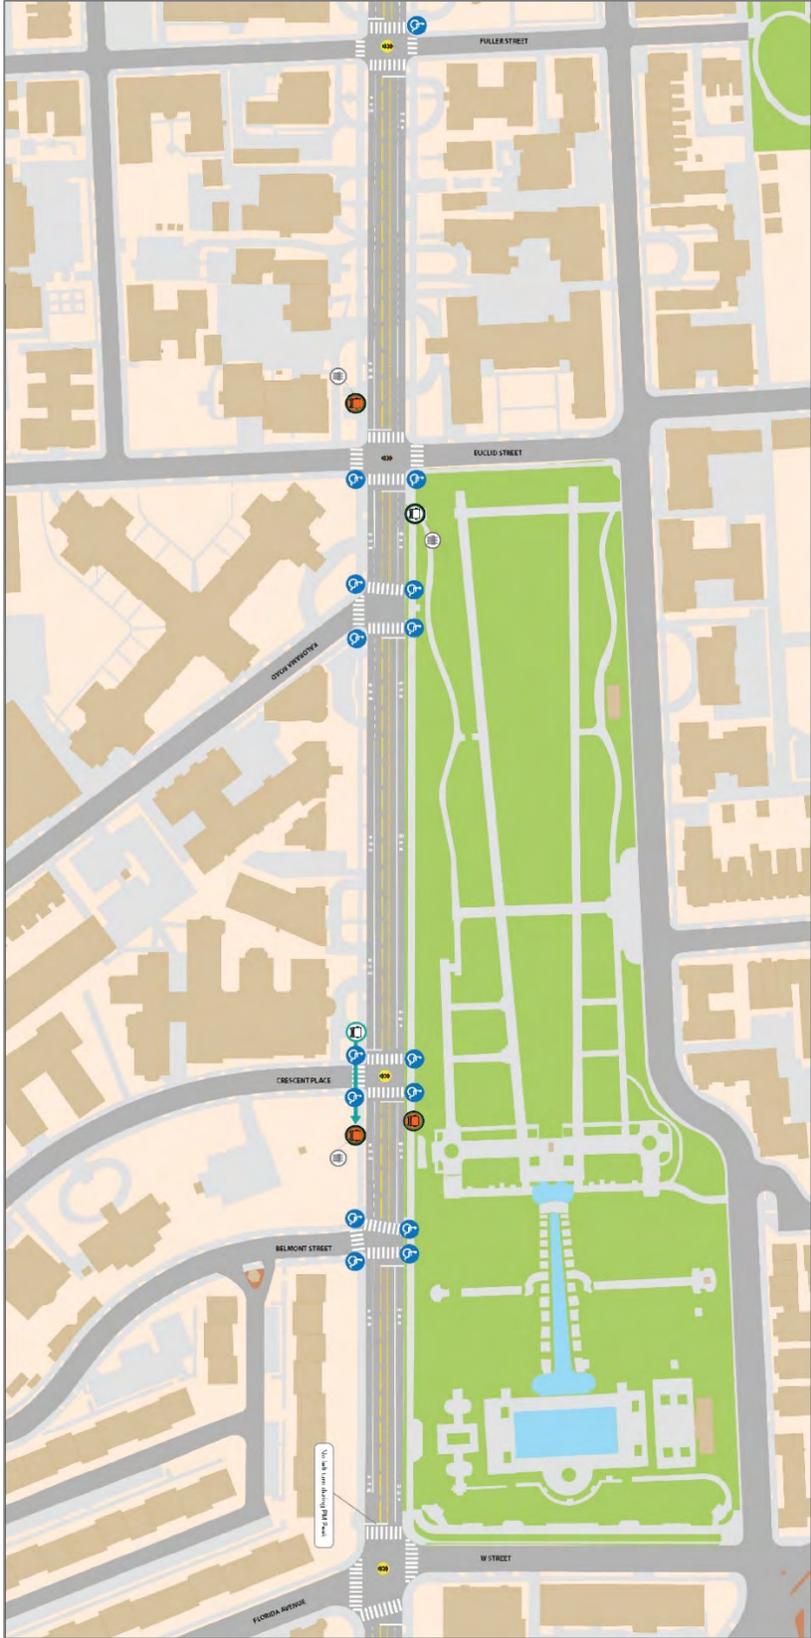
Recommended Improvements – W Street NW to S Street NW
